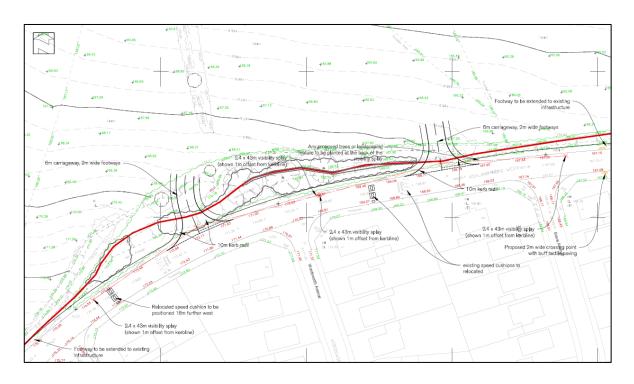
Proposed Access Junction Layout (dwg ref. ADC1032-DR-001-P7) \*a scale copy of the drawing can be found in the Transport Assessment
